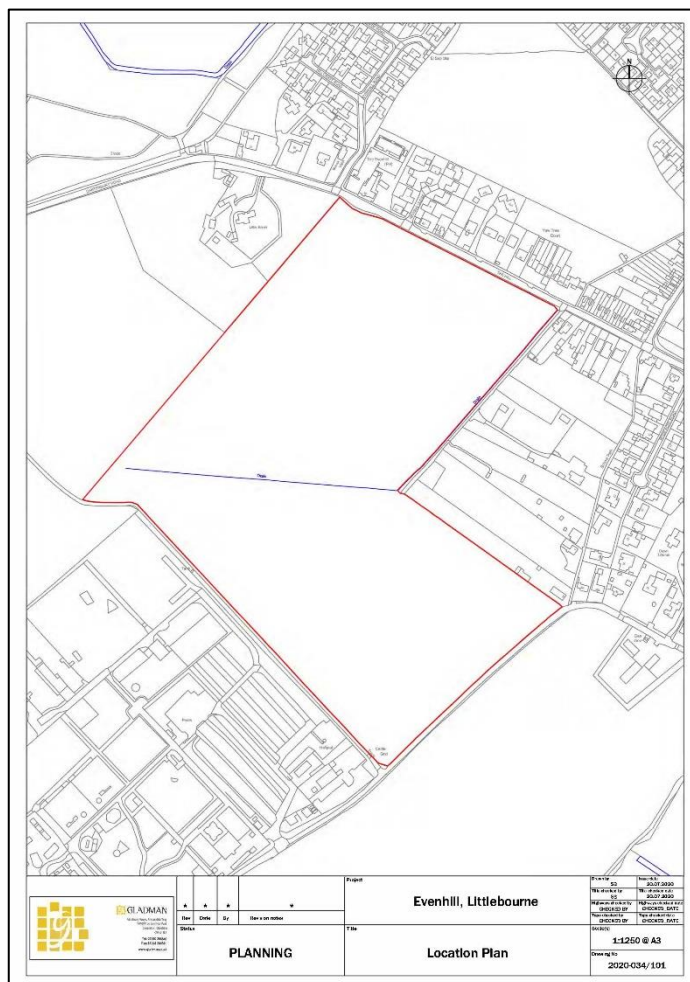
Site Location Plan- Land off The Hill, Littlebourne
